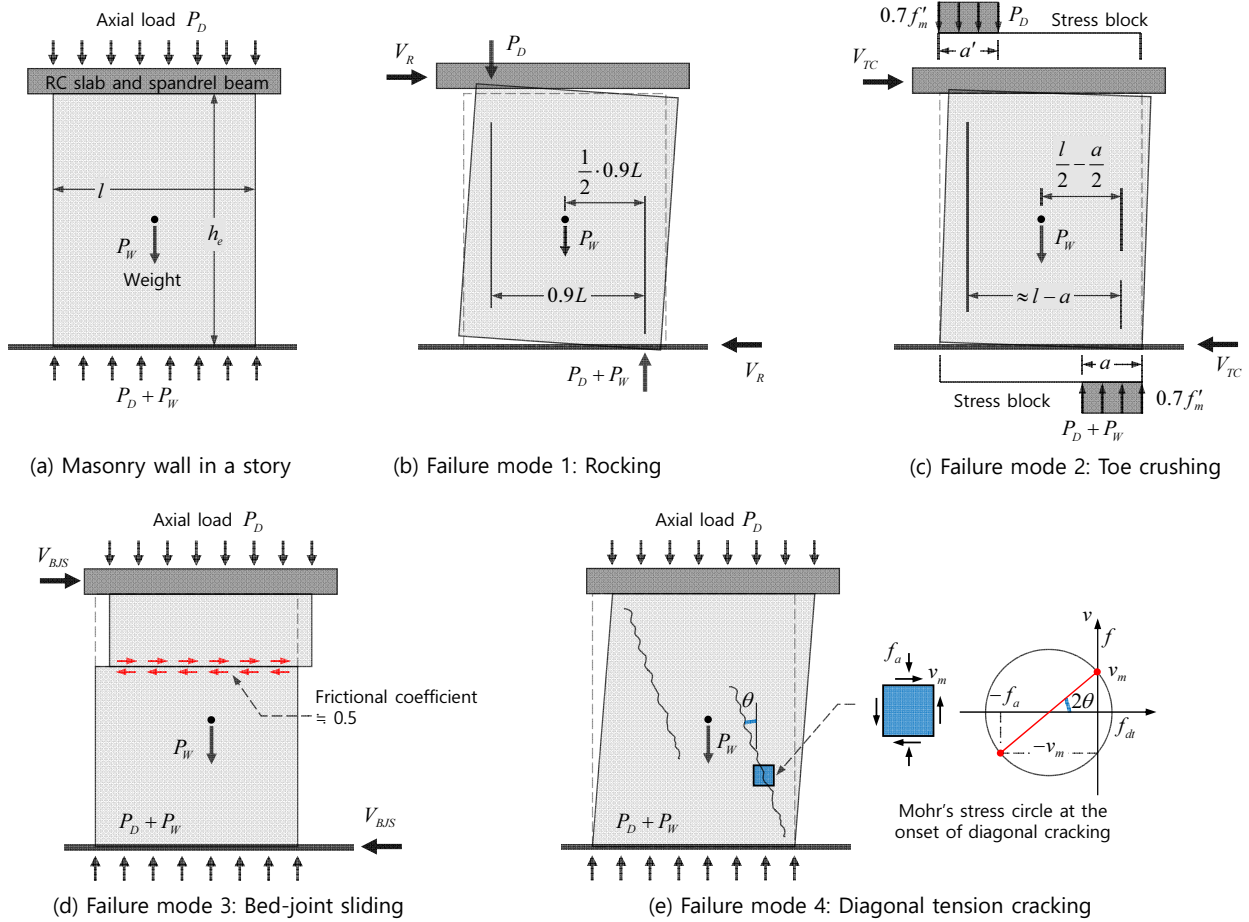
Failure modes and shear strengths of masonry walls
